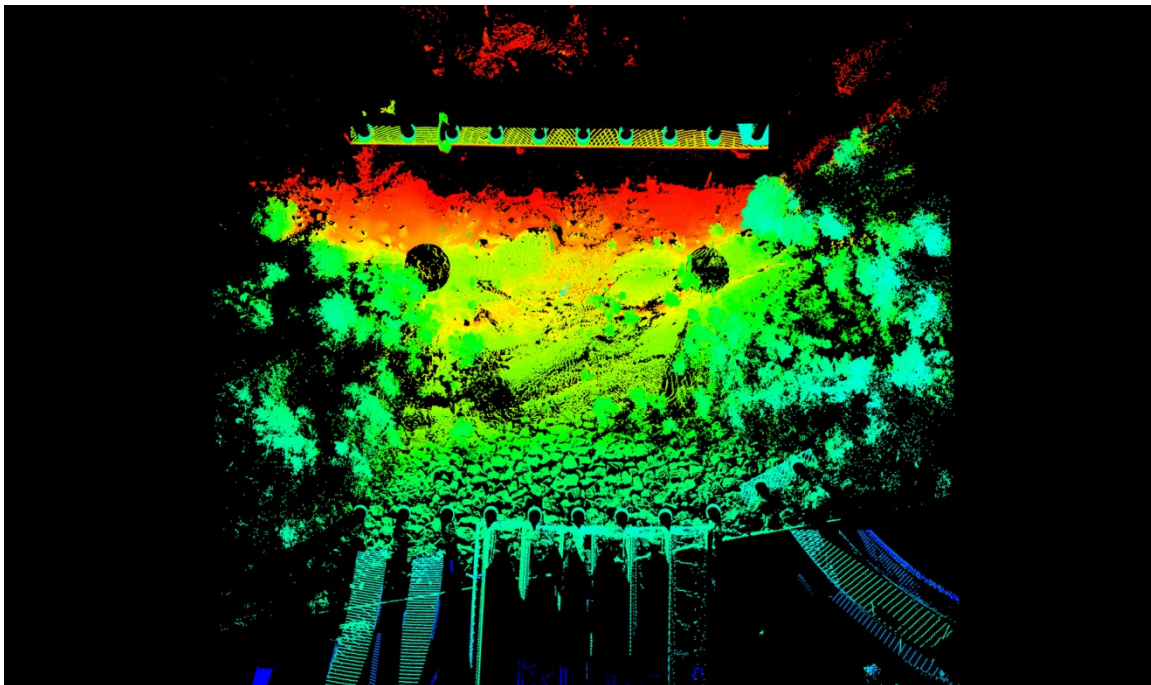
Plan view, with the Llaracon bridge deck digitally removed, of the approach deck collapse and lateral spread towards the Bio Bio River. The cylindrical cross section of the bridge piers can be seen just west of the bridge collapse (bottom of image, also seen in Figure 15.11) and the first river-crossing pier (top of image, also seen in Figure 15.11).
